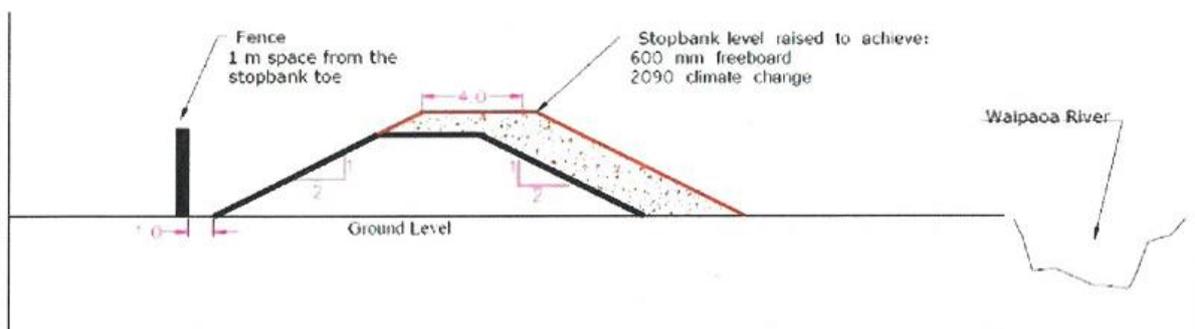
Typical section of the proposed stopbank upgrade on the riverside
